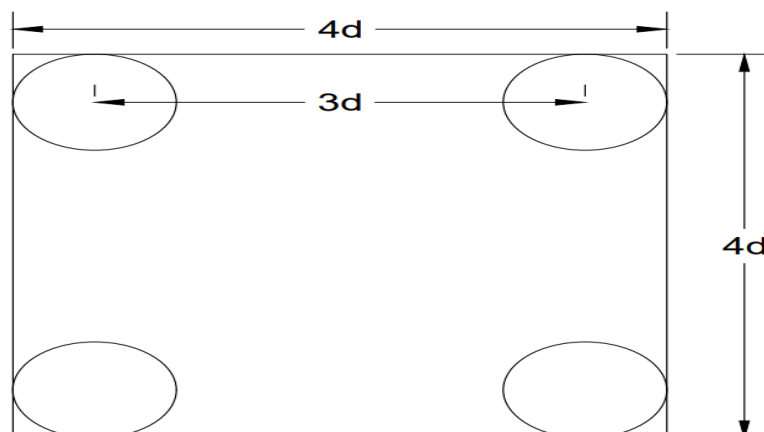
4 pile arrangement with 16 sqm. Raft size
